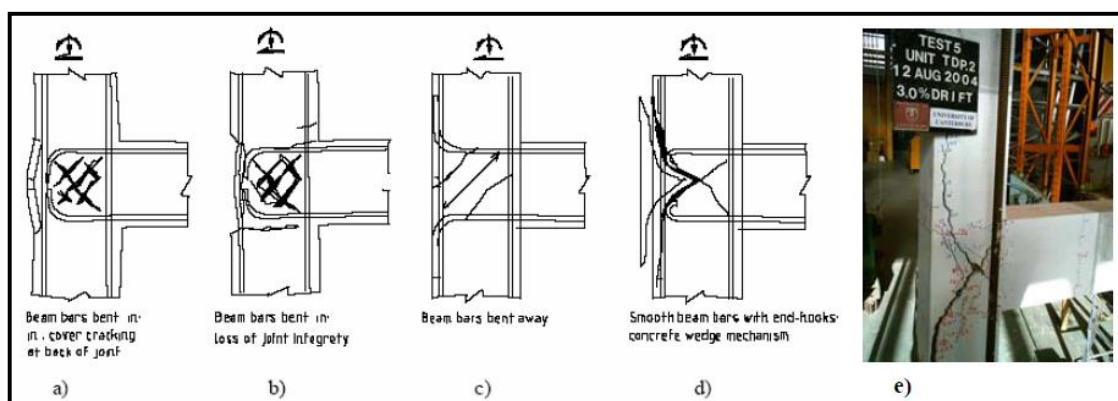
Alternative damage mechanisms for exterior Tee-joints: a,b) beam bars bent in joint region; c) beam bars bent outside the joint region; d, e) end-hook anchorage: “concrete wedge” mechanism (from Pampanin 2005).
